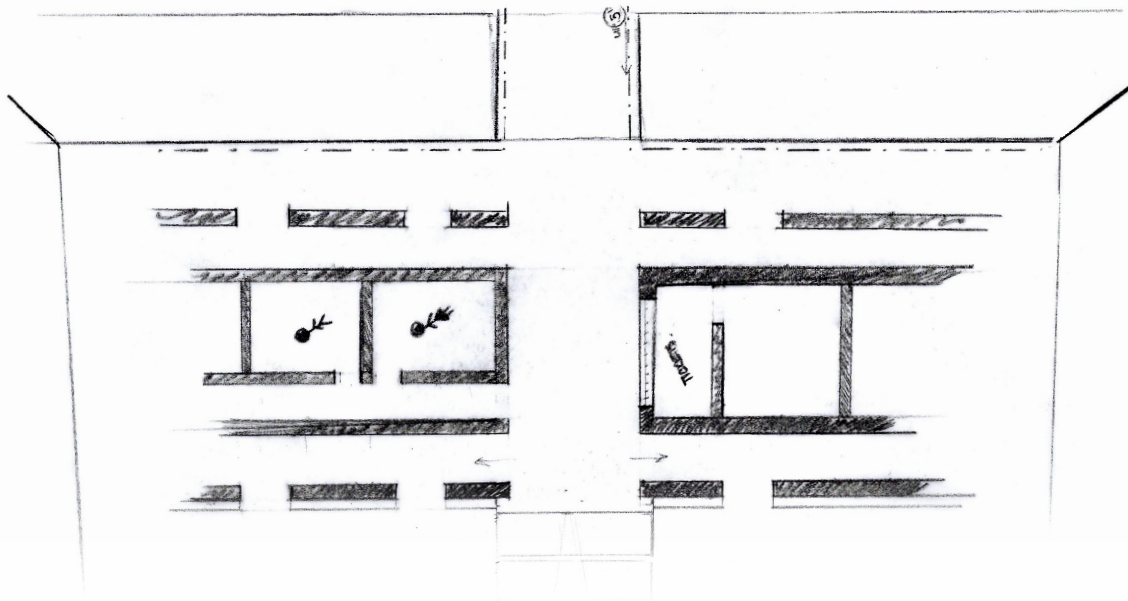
SCHEMATIC PLAN, SKETCH
